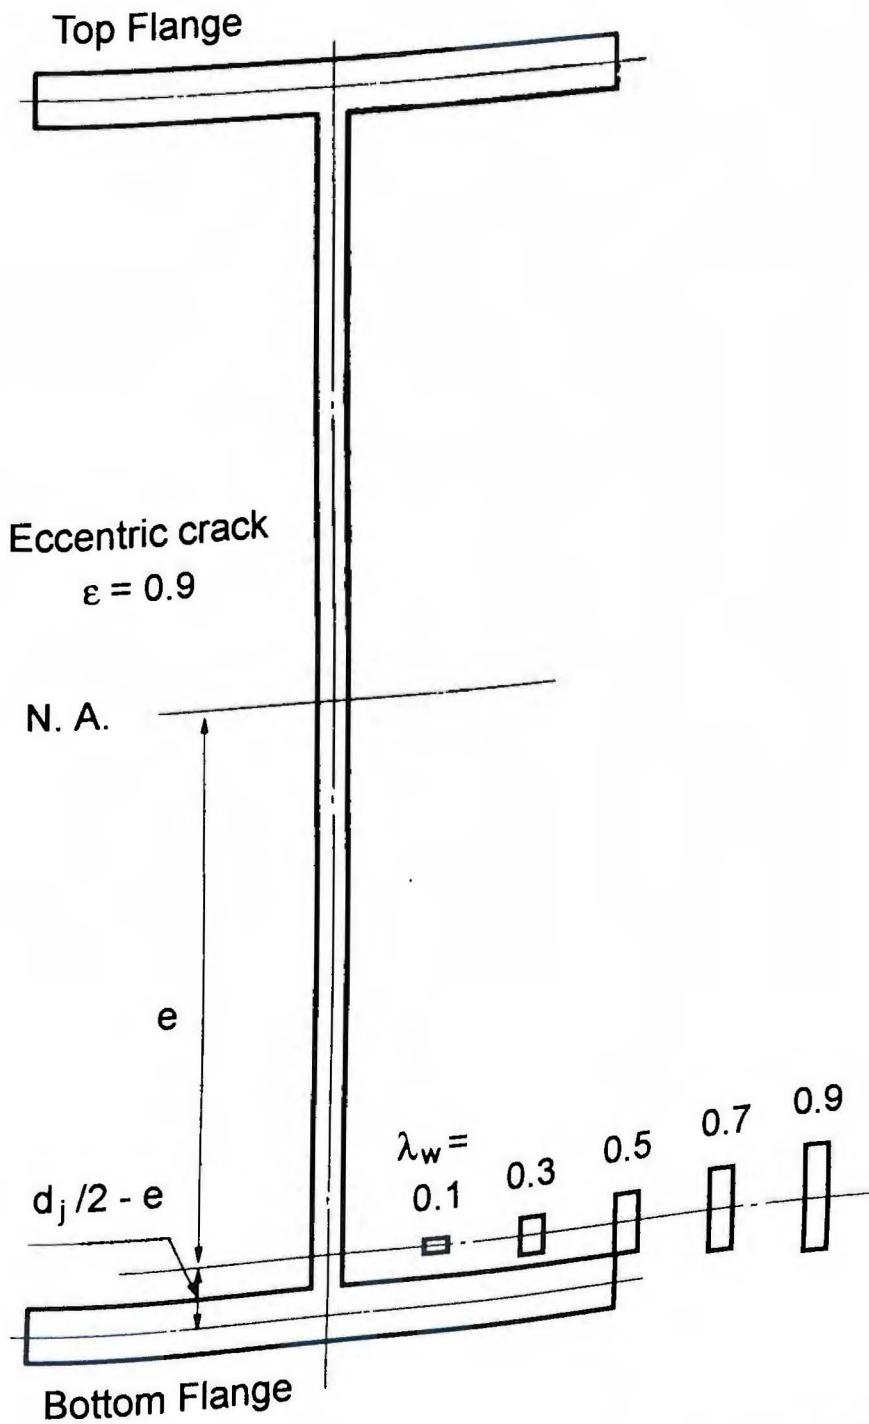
Crack tip positions for eccentric crack in two-tip cracked I-beam.
